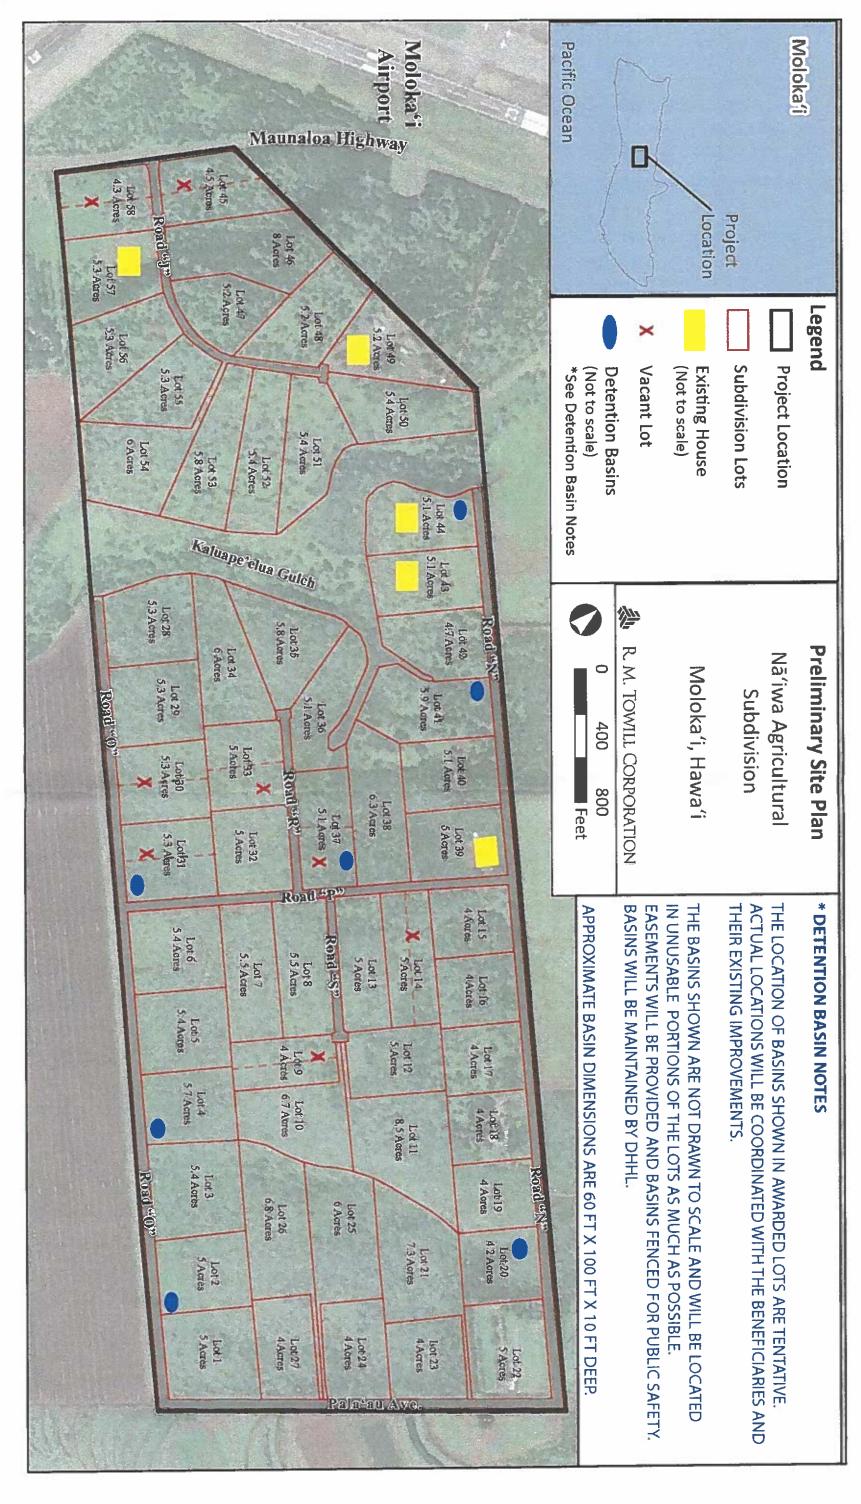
Preliminary Nā'iwa Agricultural Subdivision Site Plan
